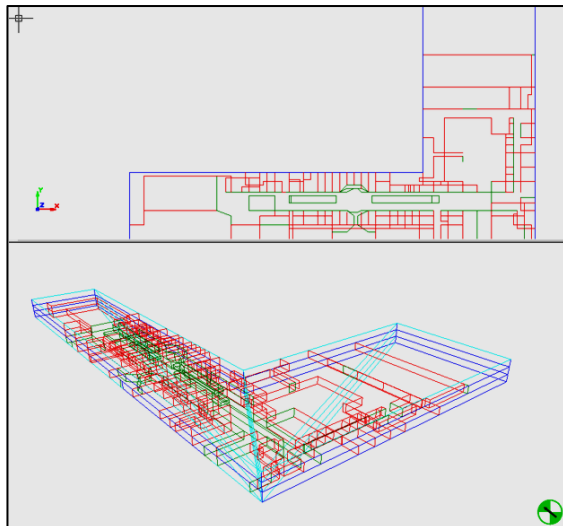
2D & 3D layout design of XYZ shopping center building in RPS.
